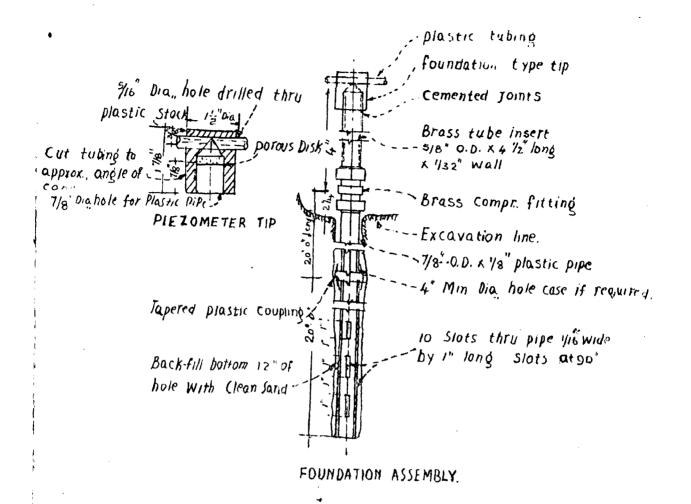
; FOUNDATION PIEZOMETER TIP (with Pipe Ext.n)
